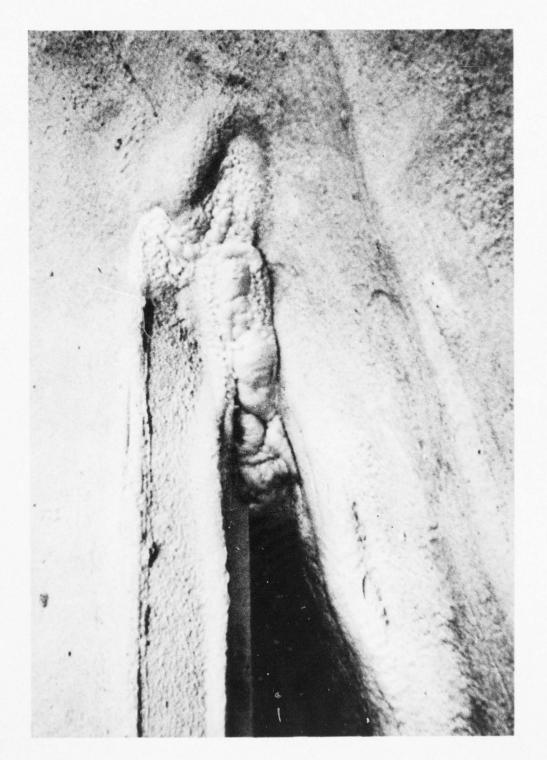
Junction of Boiler House Eave and South Building Filled With Foam
